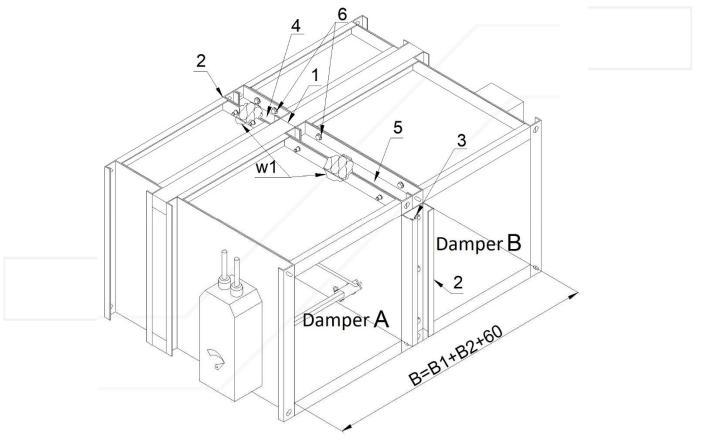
Arrangement 3 – horizontal battery consisting of two fire dampers KWP
